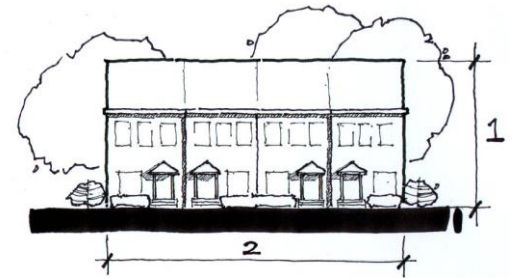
Building facades that exceed a 2:1 width to height ratio must contain variations in wall planes.
